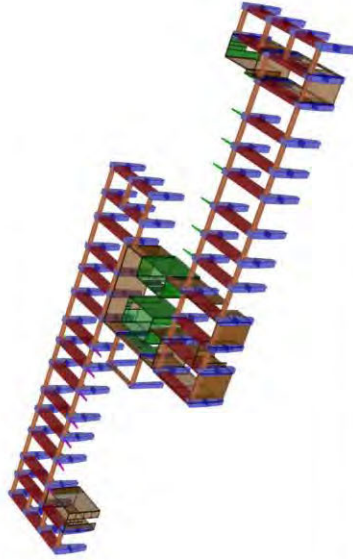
Isometric view of level 1 (concrete floor panels hidden from view for clarity) indicating walls which continue through to foundation level and transfer beams spanning in the north-south and east-west directions.
